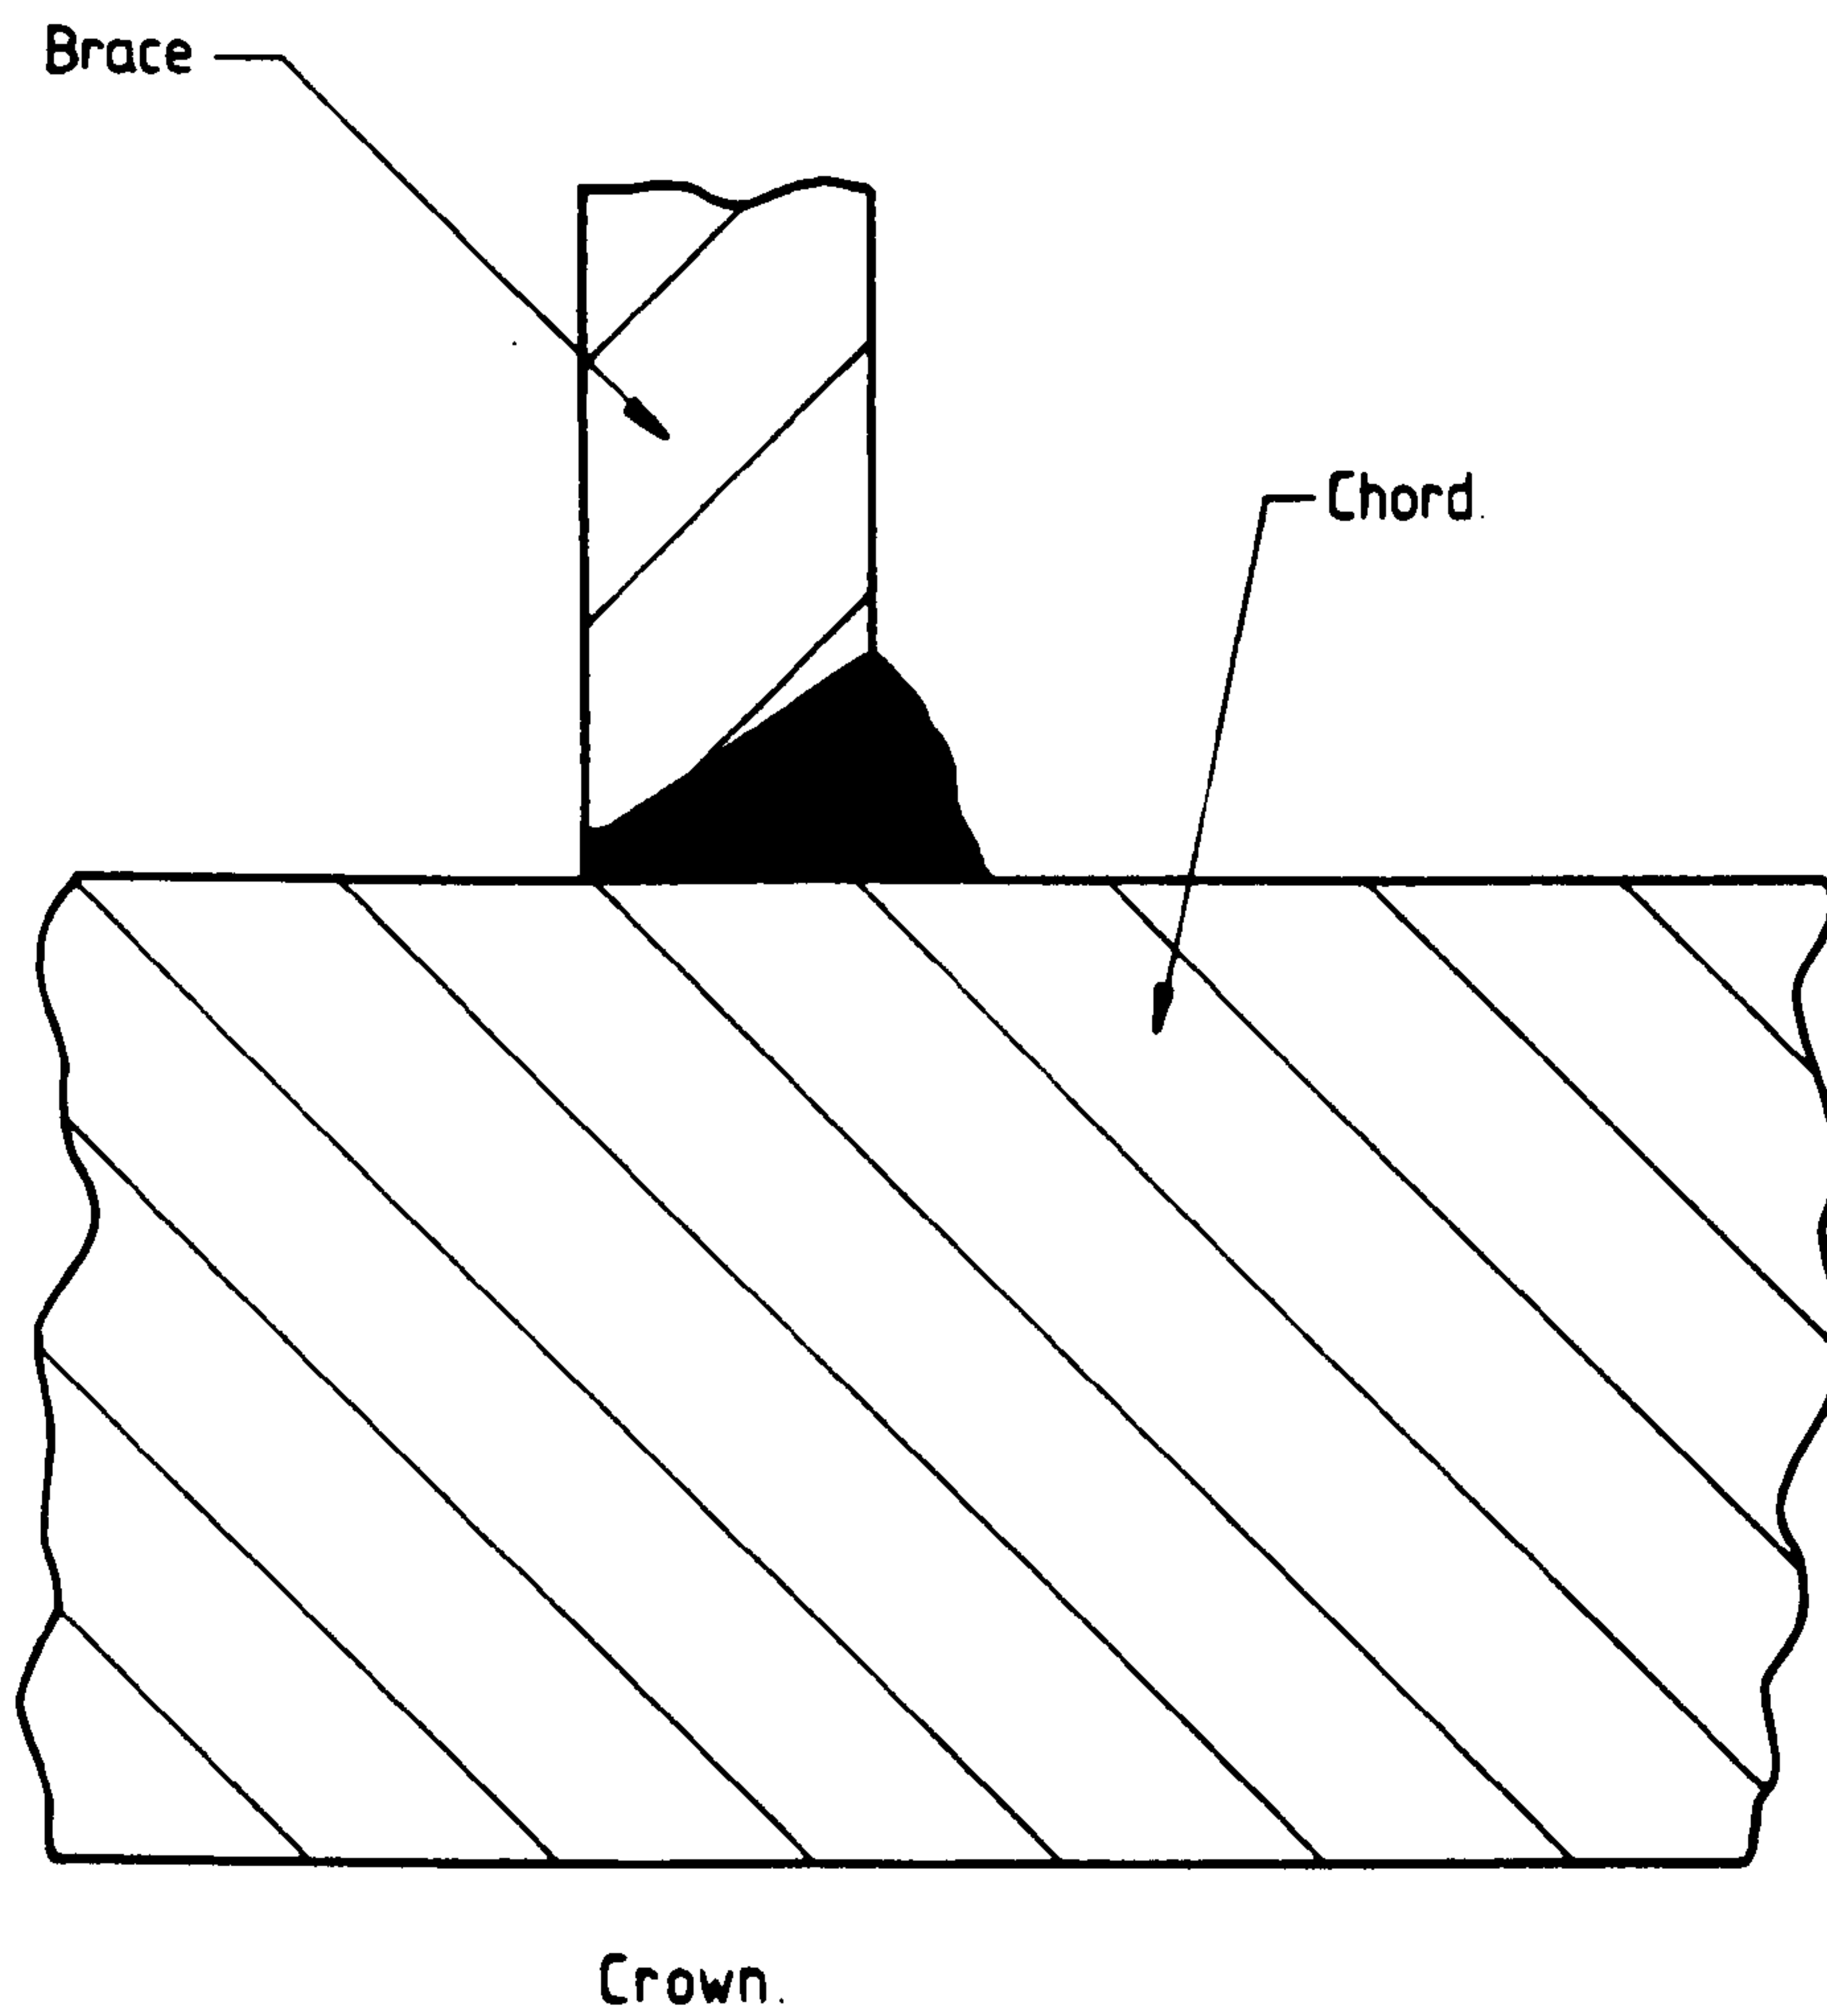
Schematic of a sharp weld toe/base metal intersection - French joint
